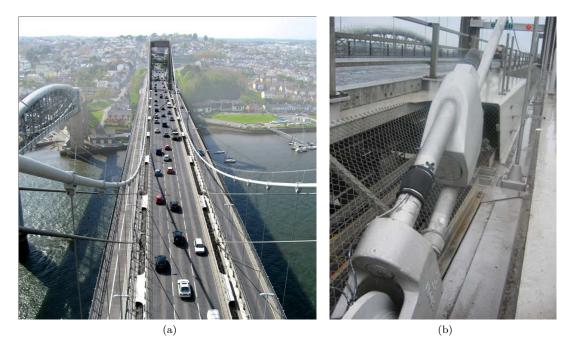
Shear boxes shown behind the hanger sockets (left) and additional stay connection at deck level with strain-gauges (right)
